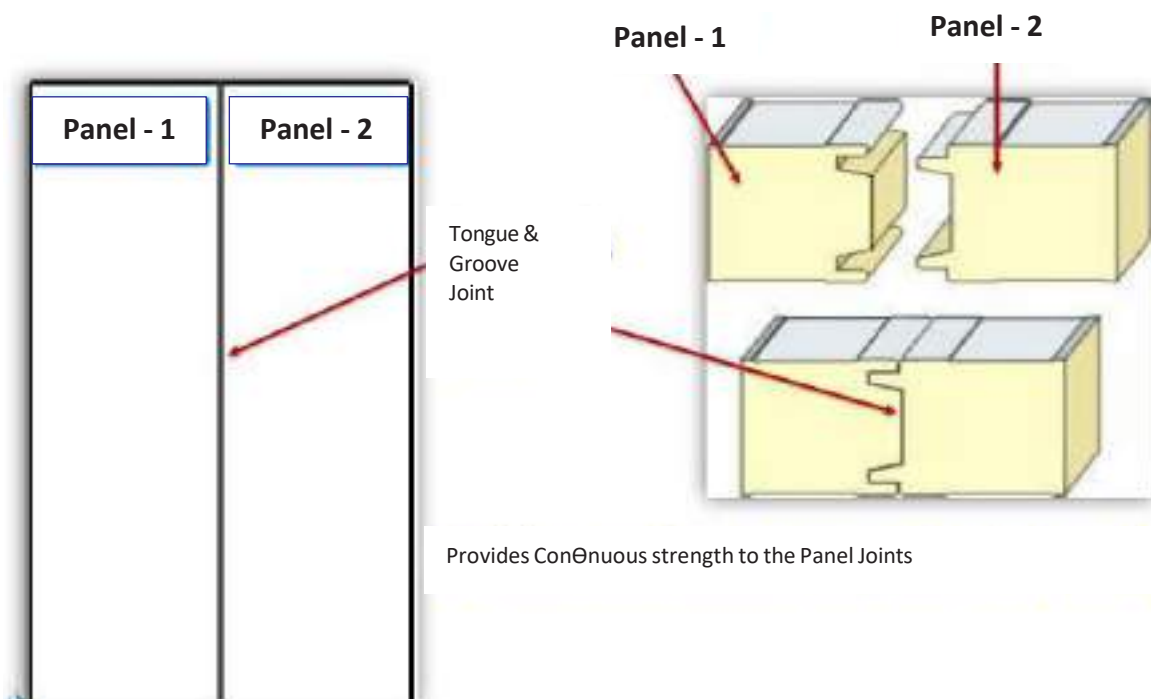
(iii) Interlocking Mechanism of PUF Panels: Tongue & Groove Joint
